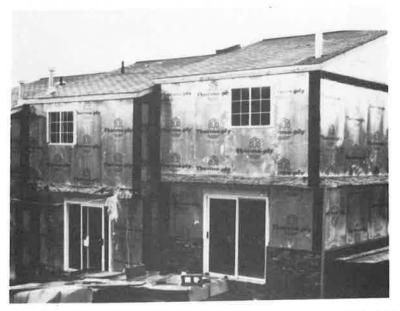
The wind barrier consists of thin (1/8 inch) sheathing, which is stapled to wall studs with overlap. Extra paper strips are mounted around corners and cantilevers to provide a continuous wind barrier.
